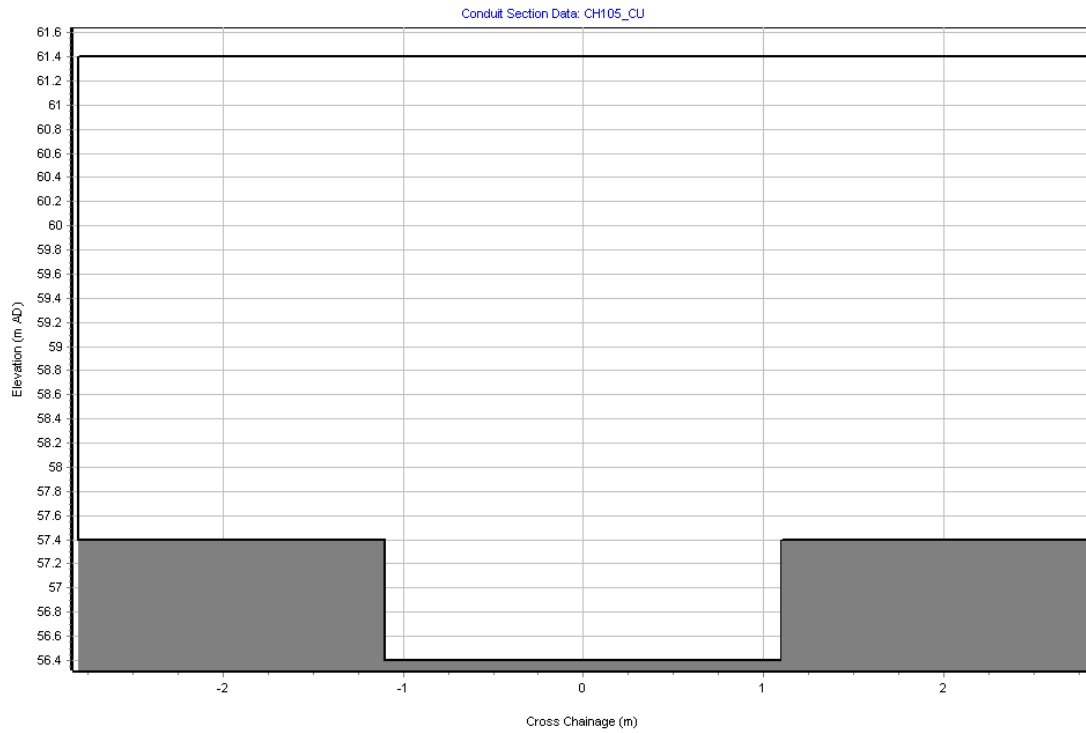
West Brook Proposed A428 Modelled Culvert (dimensions not to scale)
